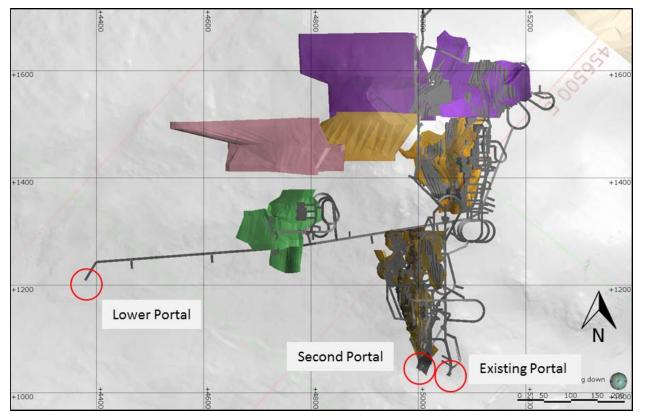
Plan View of Existing & Planned Portals with Mine Design & Mineralized Solids
